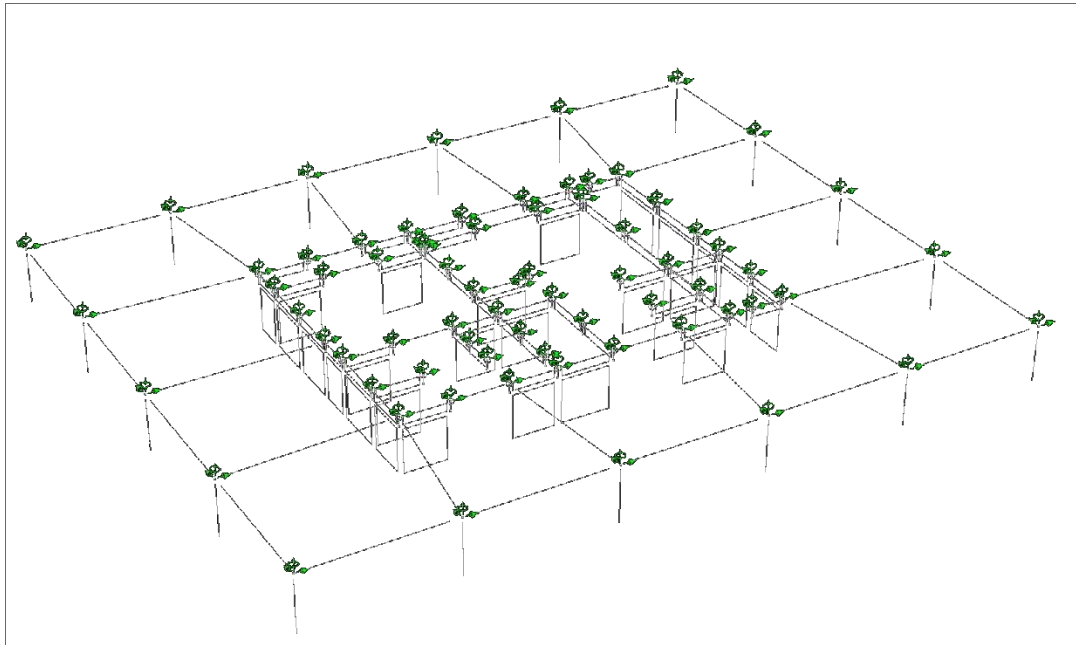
Ground Floor Plan Model with Shells of Slabs
